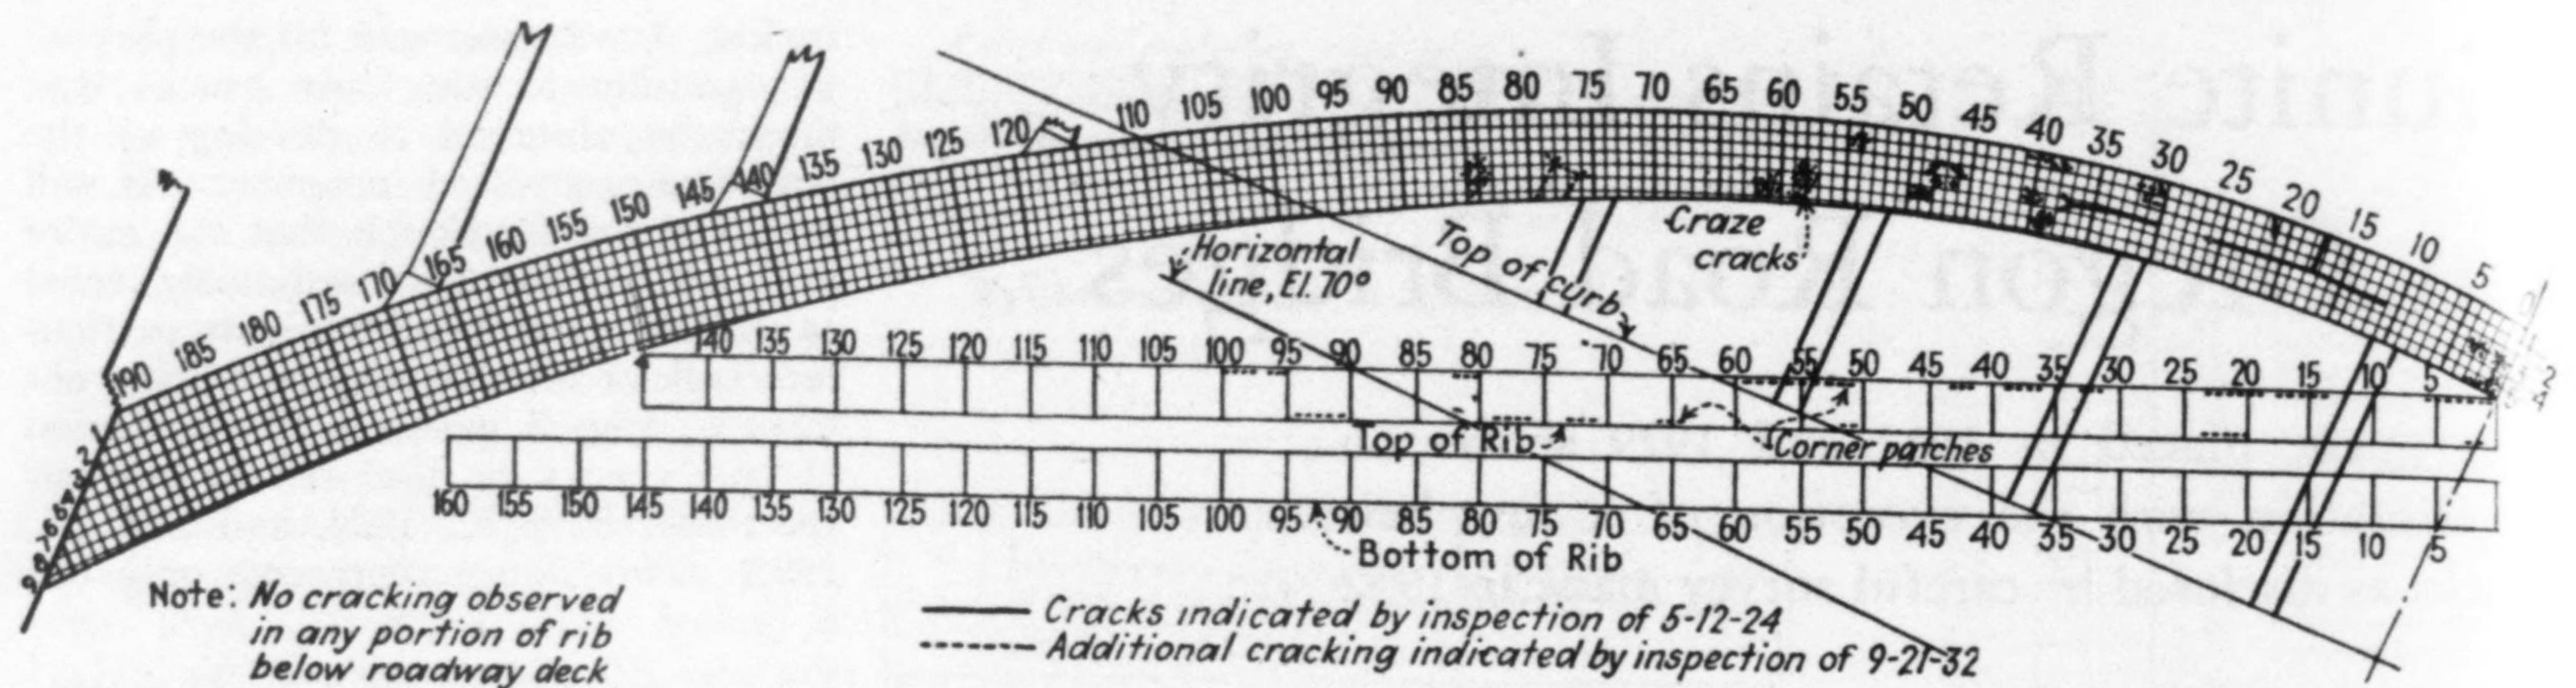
Typical sketch employed in recording cracks in incasement. Sketch shows crack record of 1924 and 1932 surveys.
